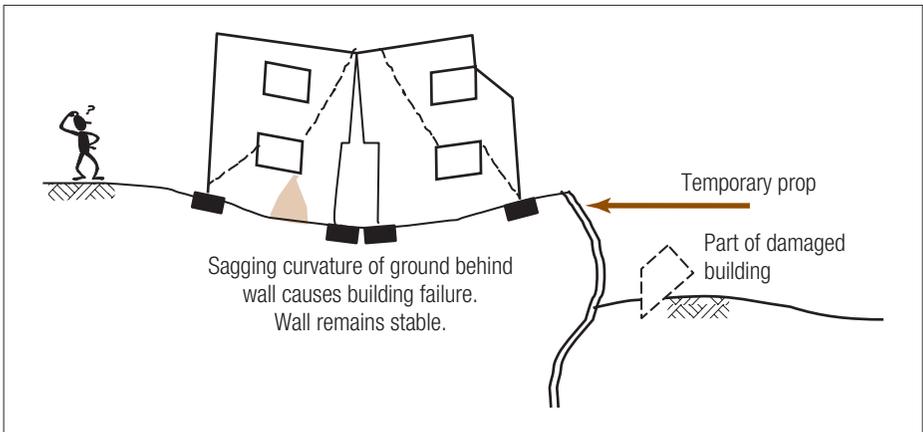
Loss of stability of structure behind a retaining wall due to excess settlement (deformation controlled ULS)
